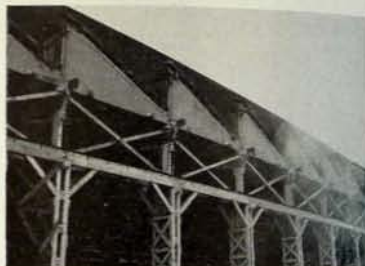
9,500 feet from GZ. Group 50, Building 2. Fire wall in gables of saw tooth roof. Bamboo lath and plaster.
